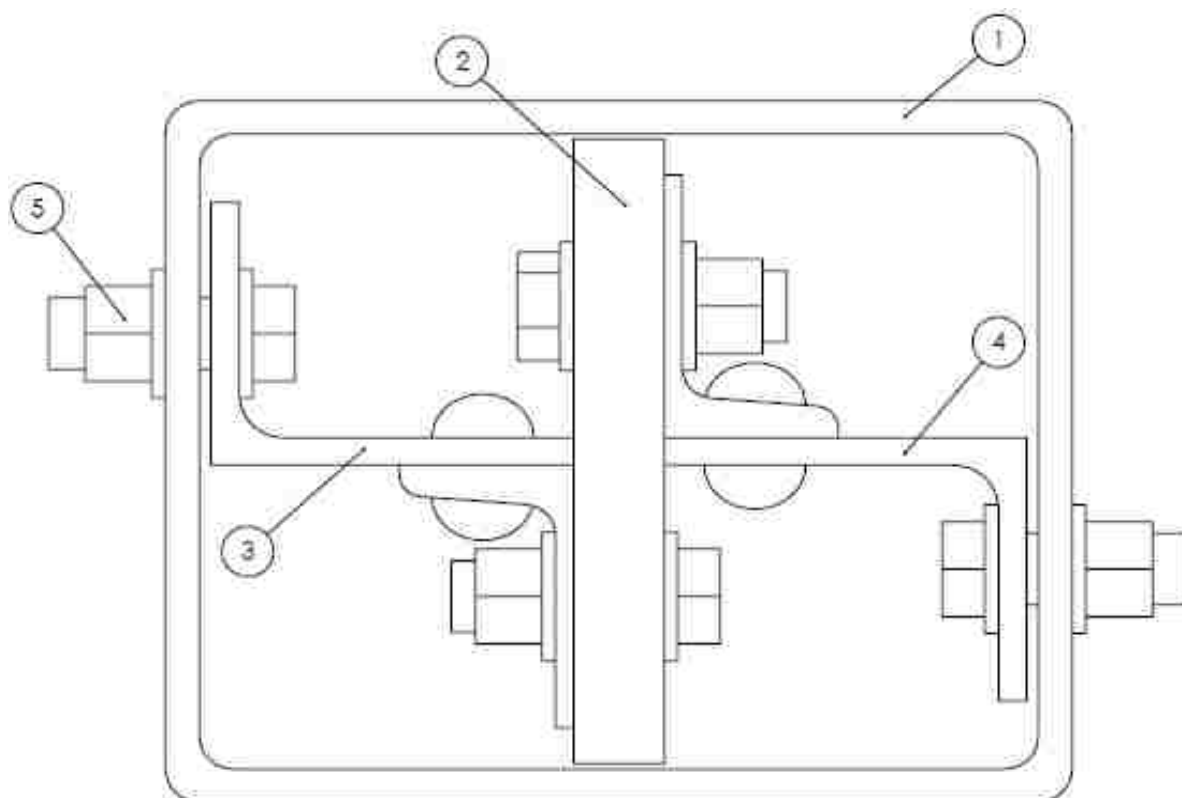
Cross Section of Small Baldwin Guardrail Configuration
